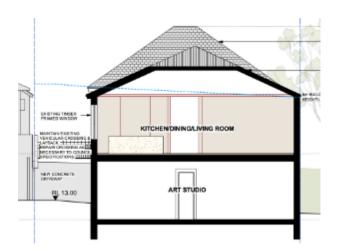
Proposed short section – Dwelling 1 (ground floor) and Dwelling 3 (lower ground floor)
